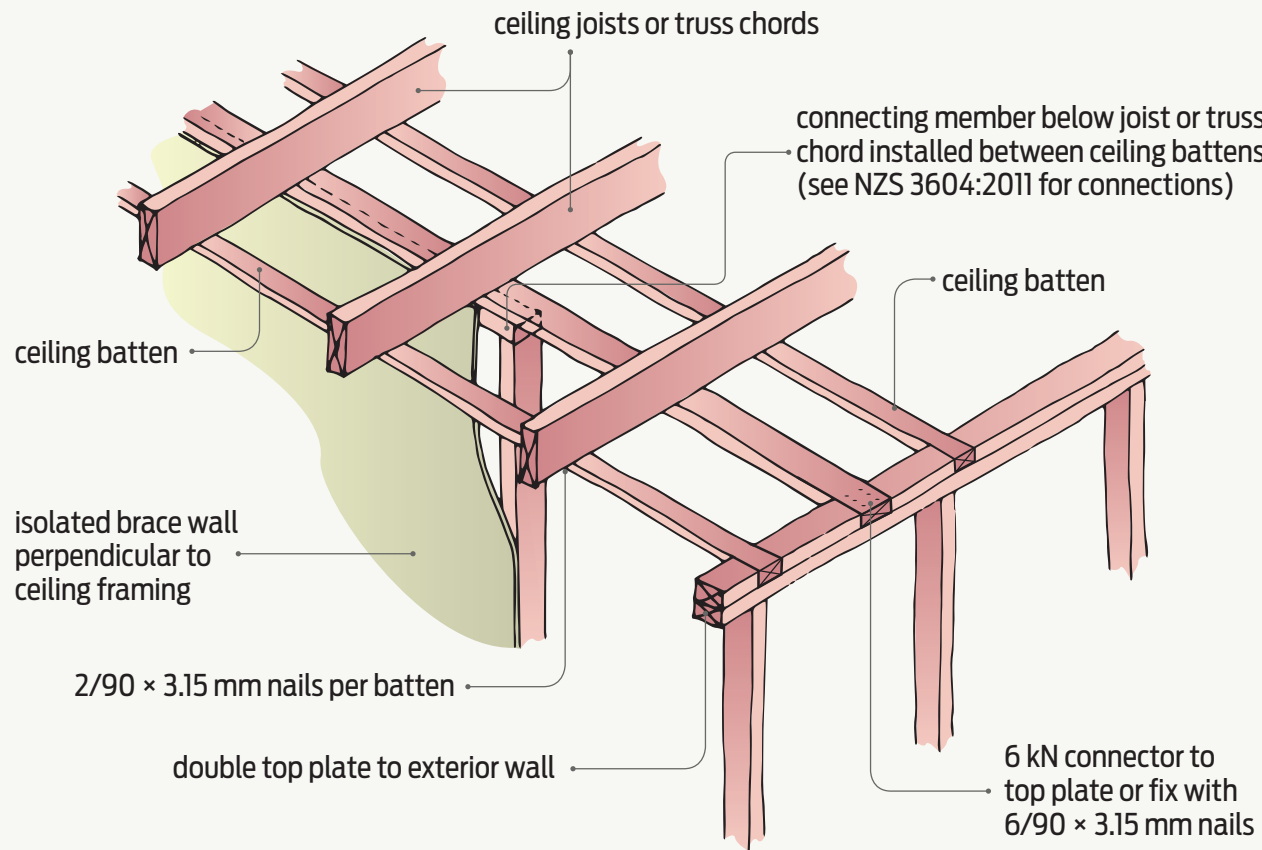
Brace wall connection below ceiling framing when wall is perpendicular to ceiling framing.
